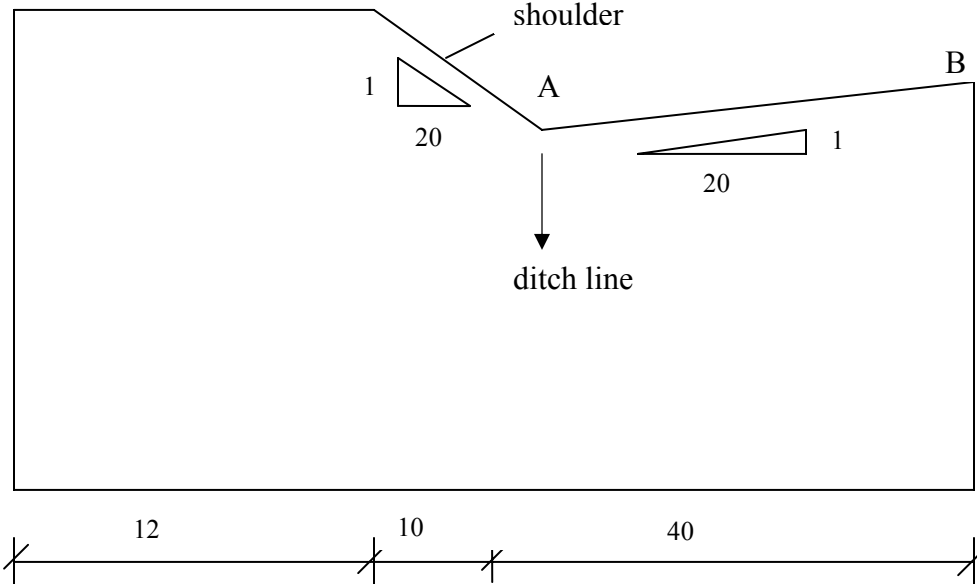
Atlanta US 271 Pavement Cross Section Sketch.
